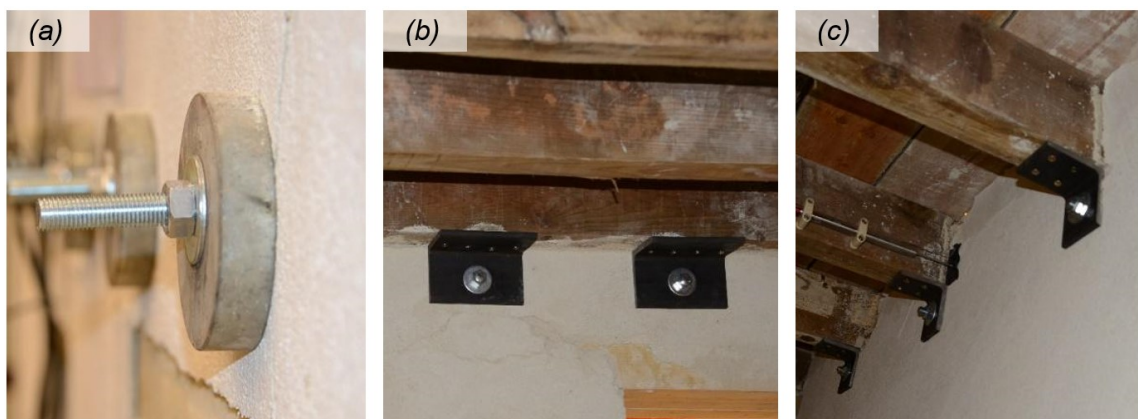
Details of the strengthening interventions against out-of-plane wall overturning: a) Bearing plate connection on the exterior of the wall; b) Steel angles along the edge beam parallel to the wall; c) Steel angles at the beam supports.
